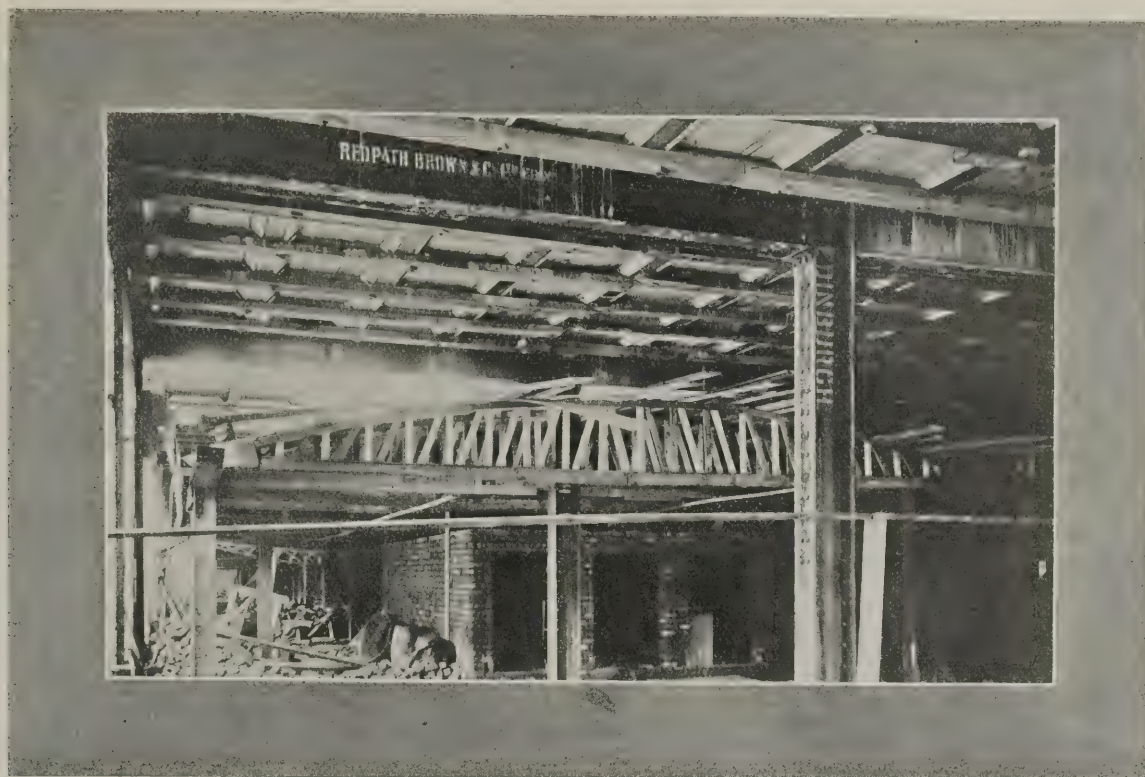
MARCH 25TH. View of interior of first floor, showing temporary Belfast timber roof, the boarding of second floor, and the new japanning stoves.
